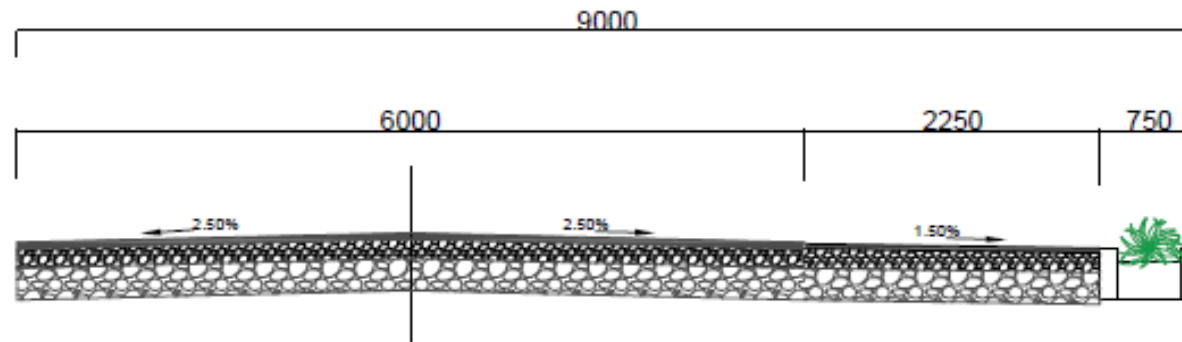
Typical Road Sections with Footpath, Drain and Retaining walls (11.5m) in Devdaha
